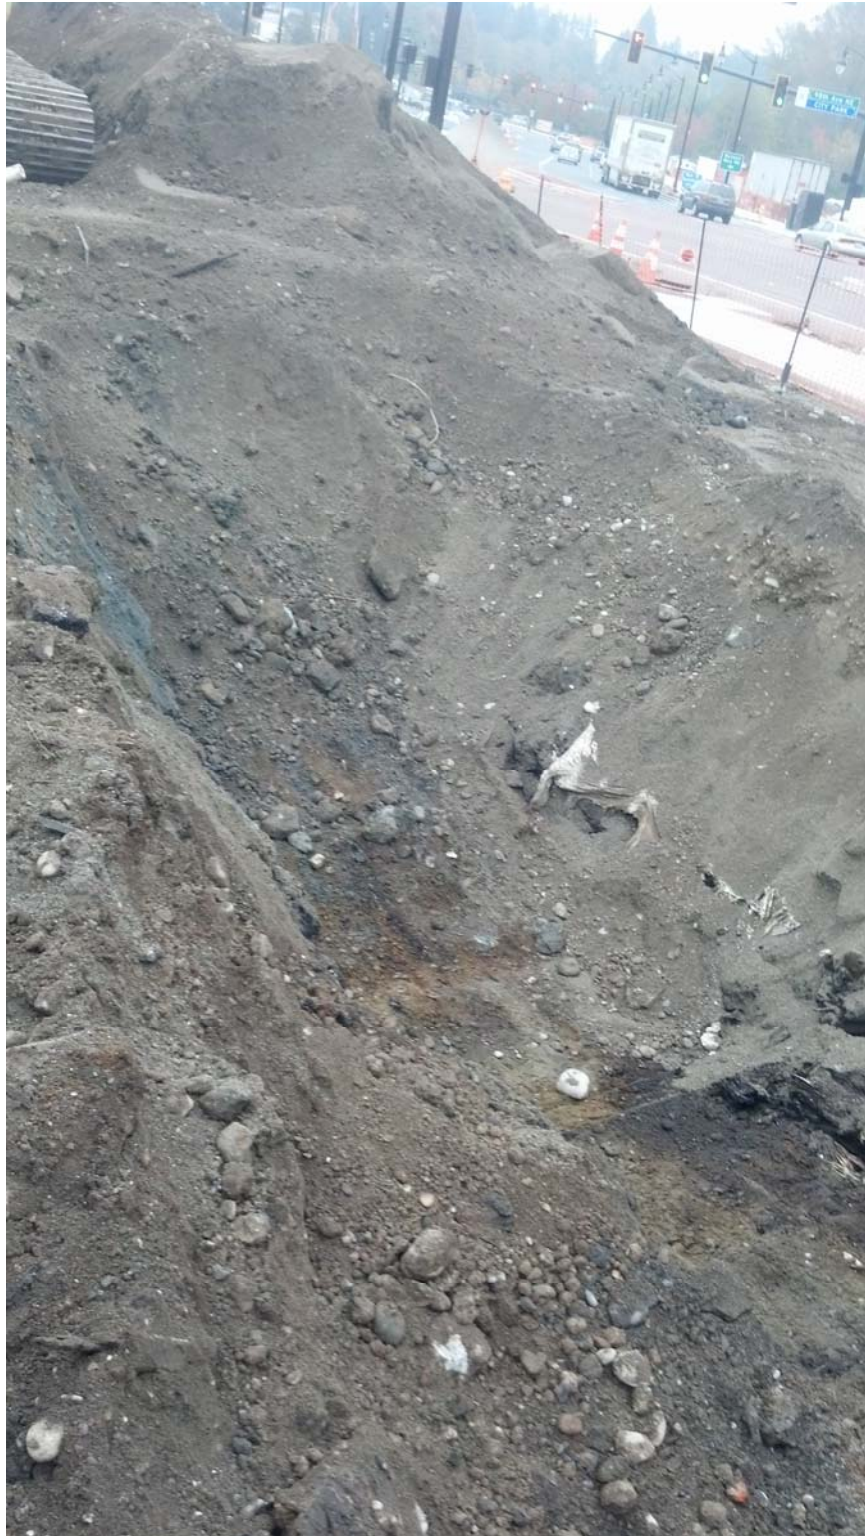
Debris and fill encountered along former SR 522 during October, 2013 remedial excavation. Photo taken at northeast corner of excavation, liner and imported backfill from 2010 Interim Action visible.
